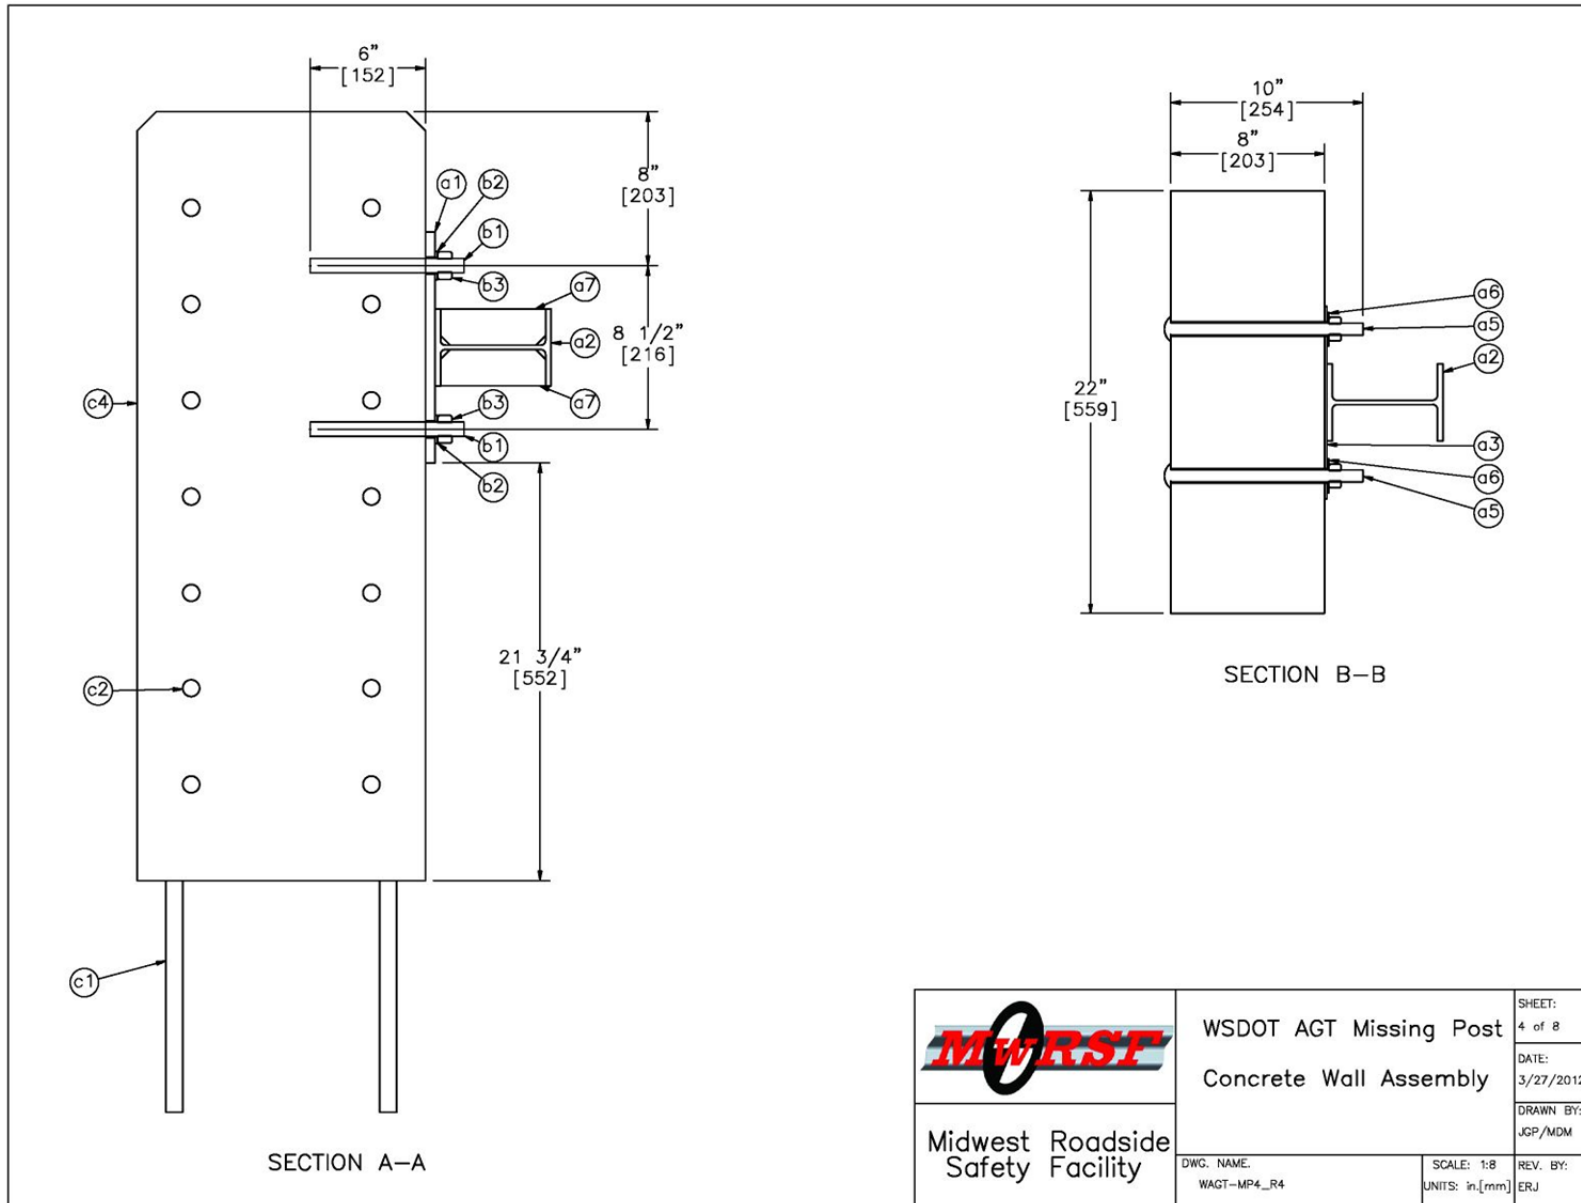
WAGTMP Bogie Testing Concrete Wall Assembly – Side View
